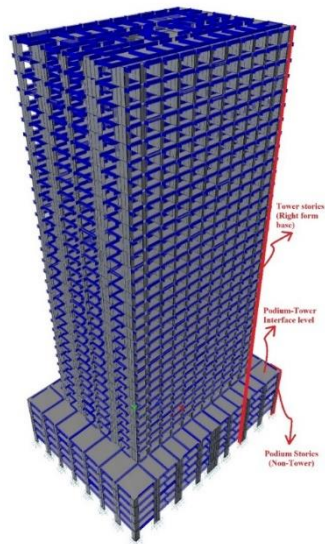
Podiums are augmented floor area at the lower level of a high rise building surrounding. At the podium-tower interface, horizontal forces are transferred from the tower to the podium. Reactive forces are developed at the podium-tower interface to resist the overturning actions (Fig. 1.2). This reacting mechanism is similar to the backstay phenomena. It can induce high intensity shear force in the structural
